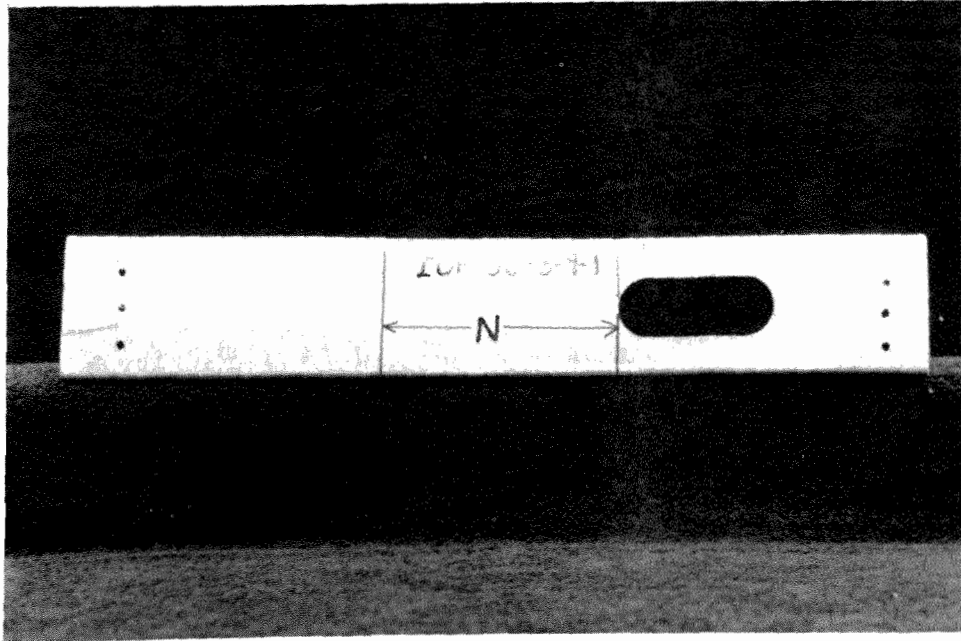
Typical Unreinforced Web Crippling Failure, IOF-SU-8-9-1
